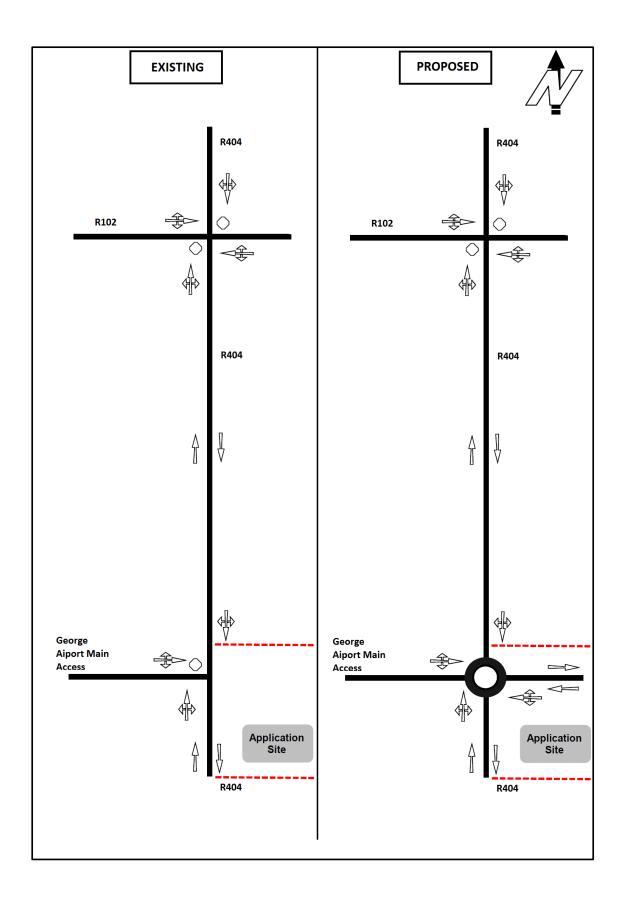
Existing and Proposed Road Network and Lane Layout
